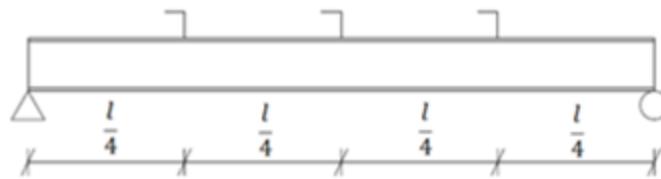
A side view of a girder attached to three purlins at its tension flange.
